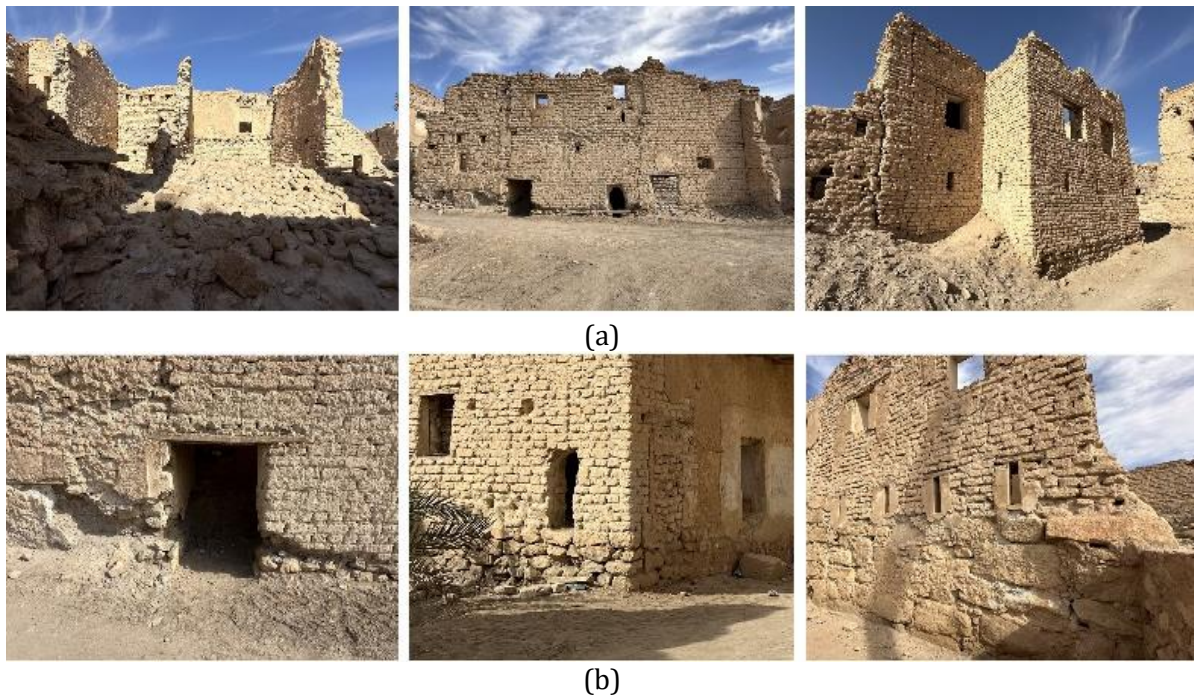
Views of the wall systems in the ksar of Lichana: (a) load-bearing walls (base, wall, and top); (b) construction systems of the base of load-bearing walls (with and without stone footing). Photos by authors, 2024
